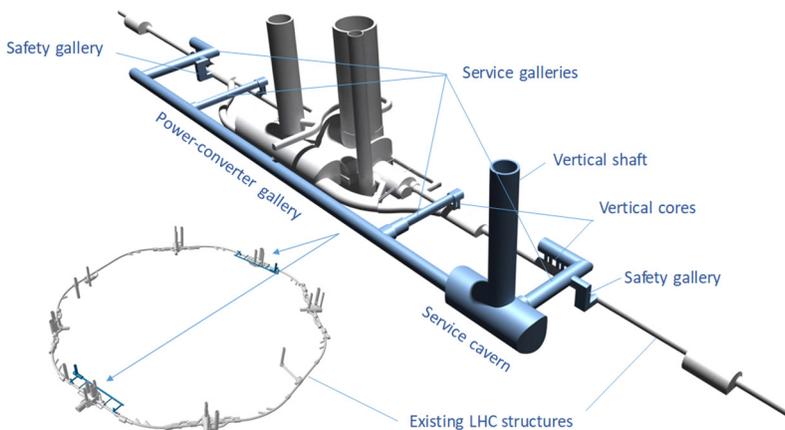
Typical HL-LHC underground civil engineering structures at Point 1 and Point 5.
